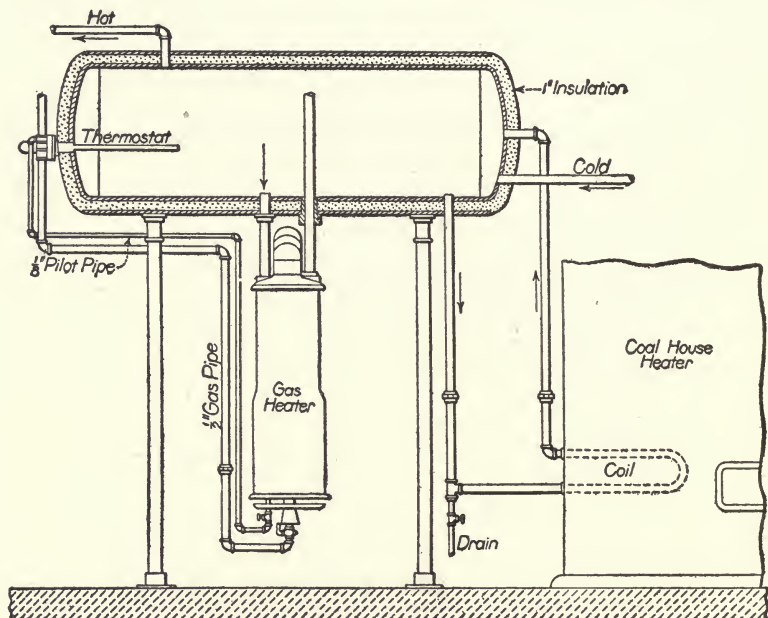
Automatic Gas Heater and Coil in Furnace Connected to Large Storage Tank.
